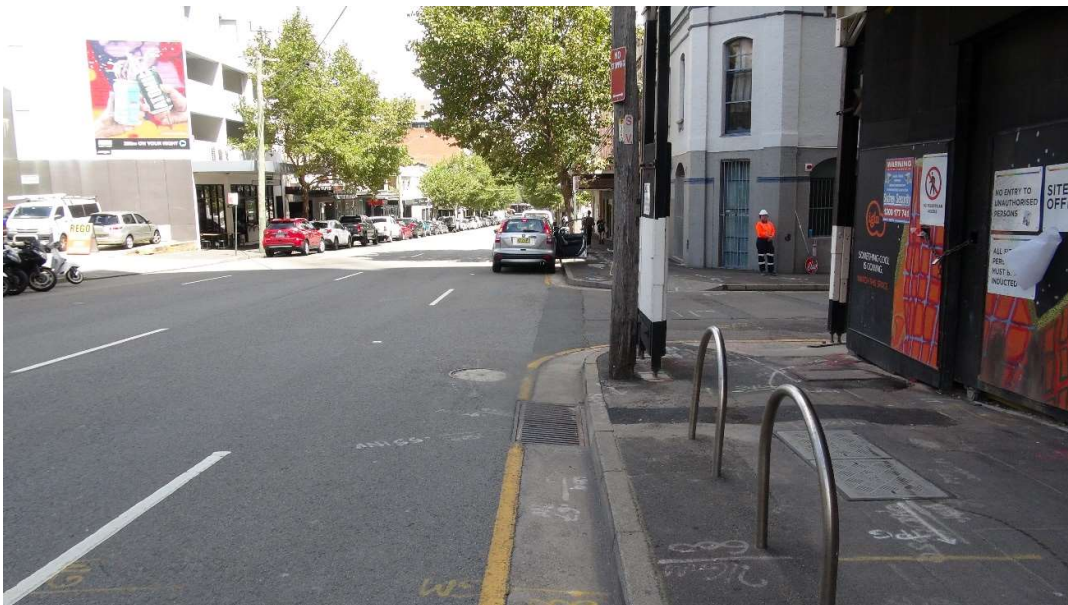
showing the intersection of Regent St and Marian St. Stormwater would be capture by the existing kerb inlet pit during minor storm. During the major storm, floodwater may split at this junction draining into Marian St.
